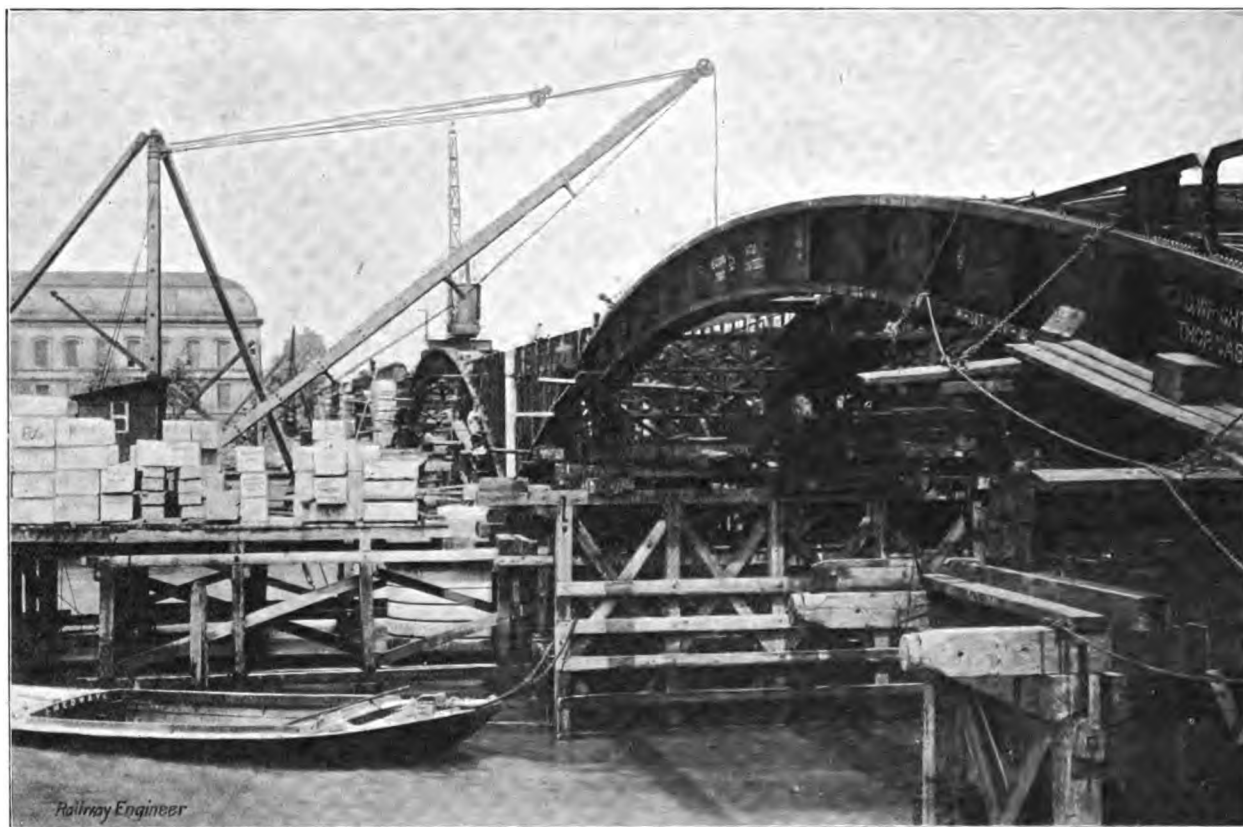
View looking North from South Abutment, showing Spans 3 and 4.
